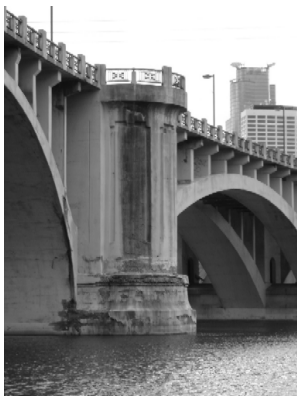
Staining and concrete spalls are visible on the north face of the west end of the pier between the barrel and rib arches.
